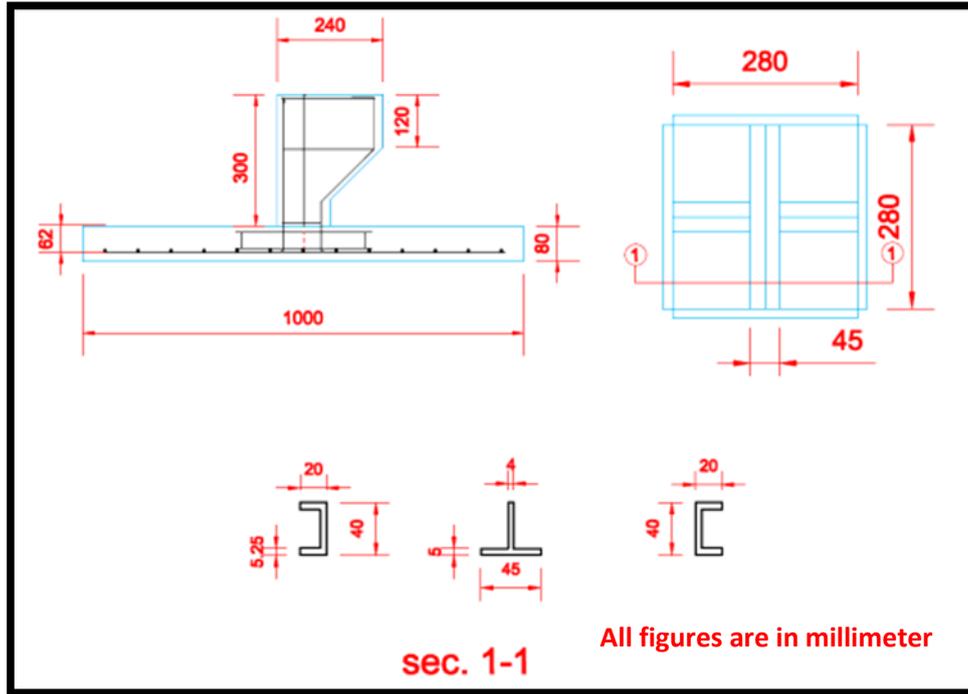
Dimensions and Layout of Slab with Shearhead of Single Cross Stiffener
